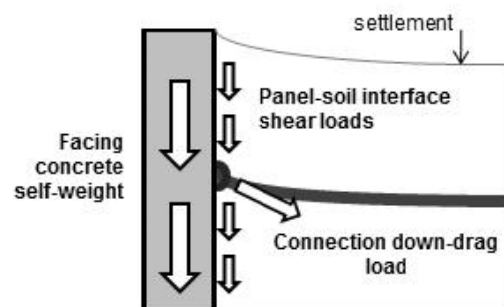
Contributions to vertical axial loads in concrete facing panels.
